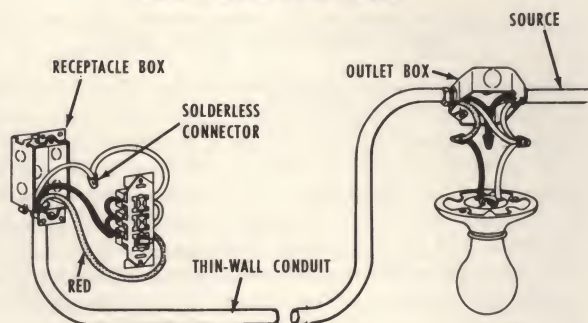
SWITCH AND OUTLETS ADDED TO CEILING LIGHT
